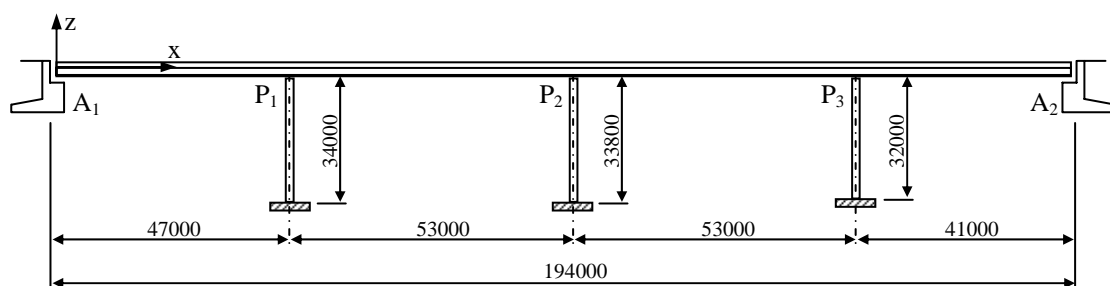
Elevation view of Chidorinosawa river bridge.
